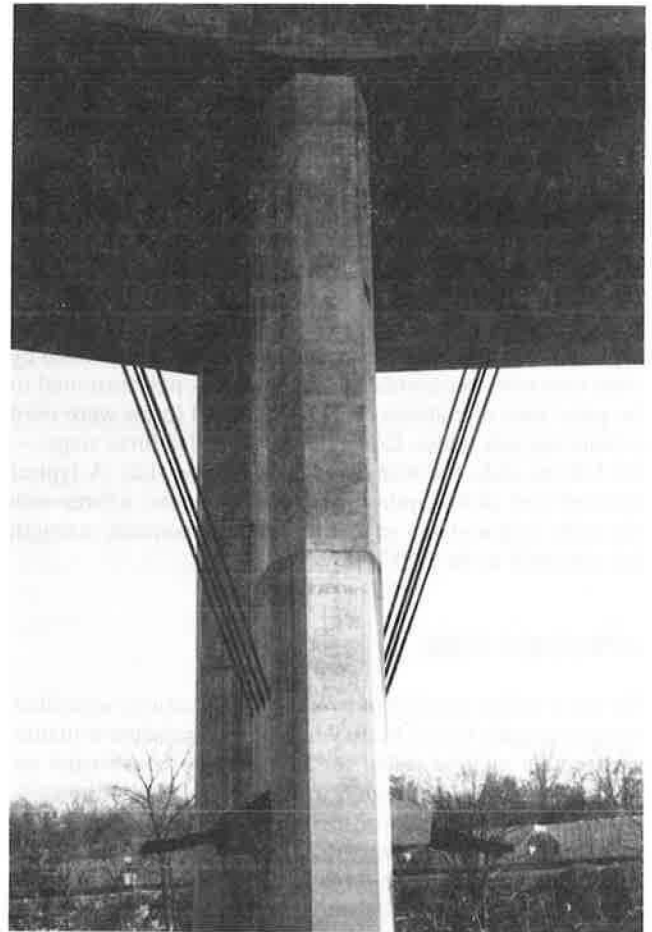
Pier table (two-web) with brackets awaiting traveler erection.
